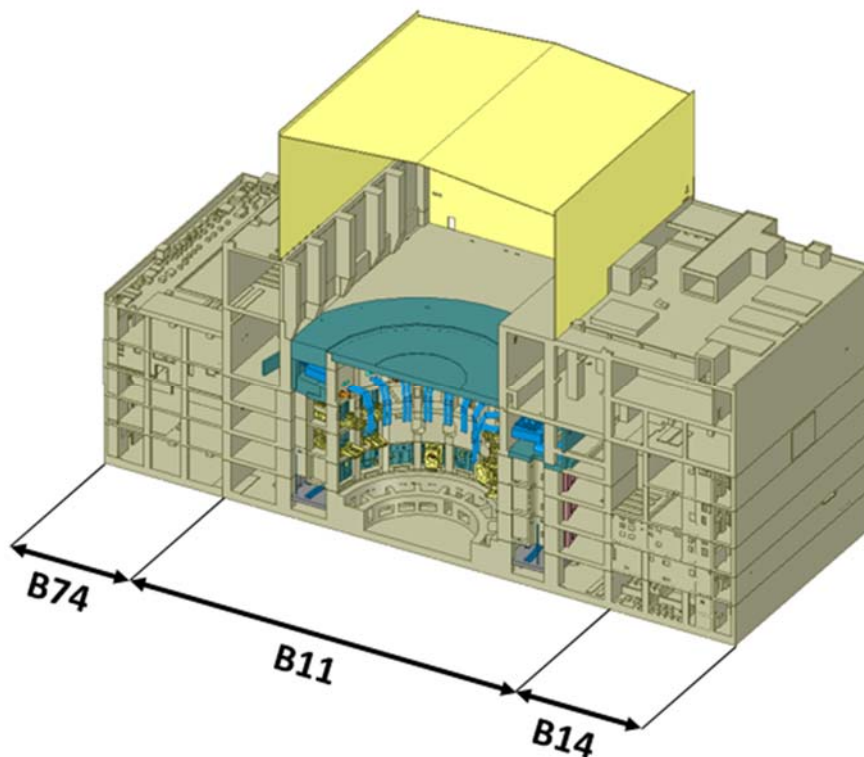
Vertical cross-section of a simplified representation of the Tokamak Complex. The Tokamak Building (B11), Diagnostics Building (B74) and Tritium Building (B14) are indicated. The ITER Tokamak would be located at the centre, inside the B11 building. Taken from [23].
